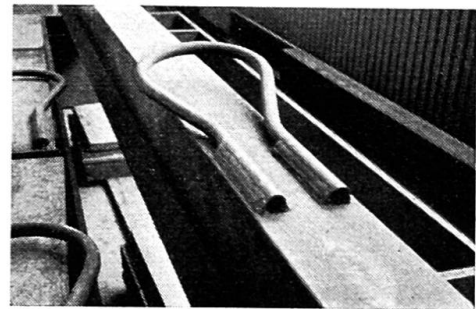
The Connector, Welded to the Steel Beam Flange.
